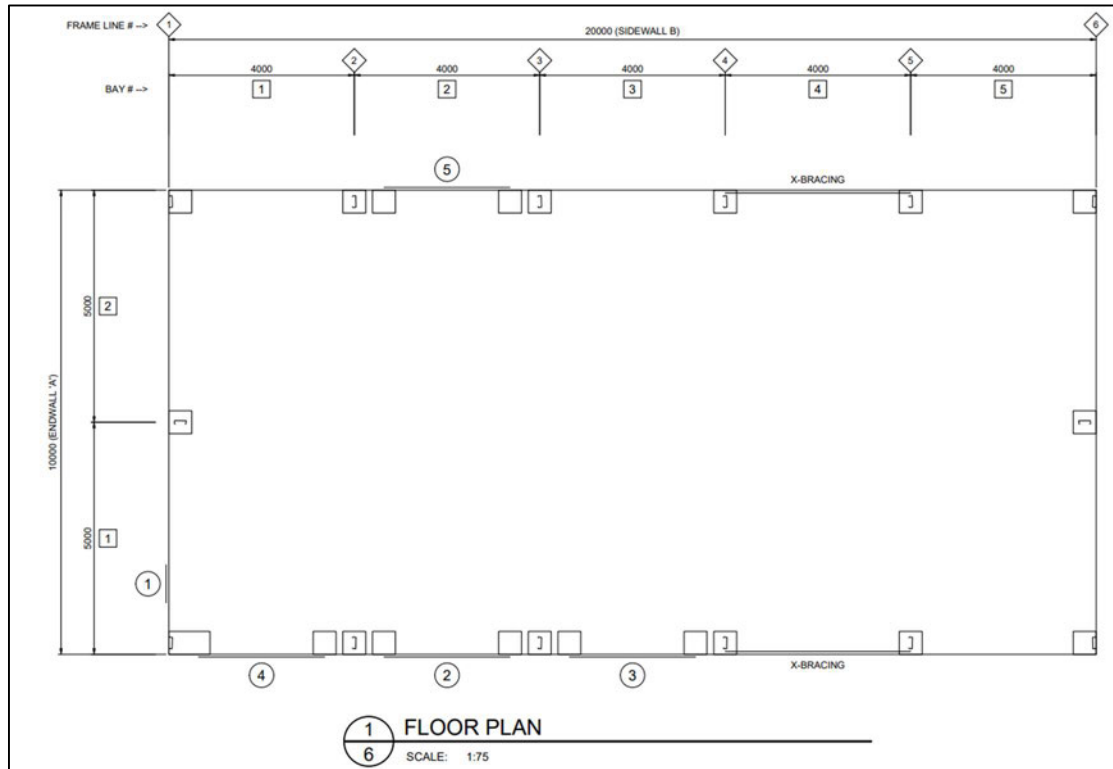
Floor Plan Prepared by Emerald Design and Construction (Appendix 2)
